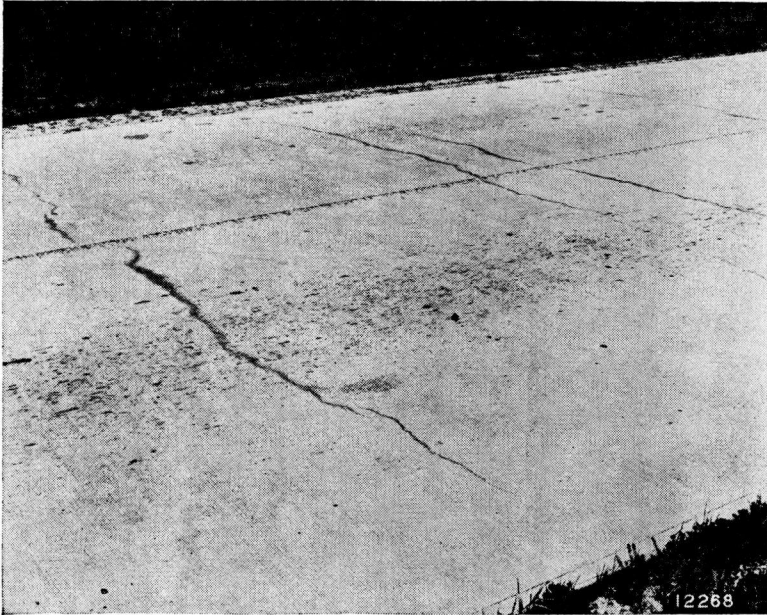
Stained Cracks in 7-in. Pavement Containing 0.7 Percent Steel—Pavement is in a cut.
